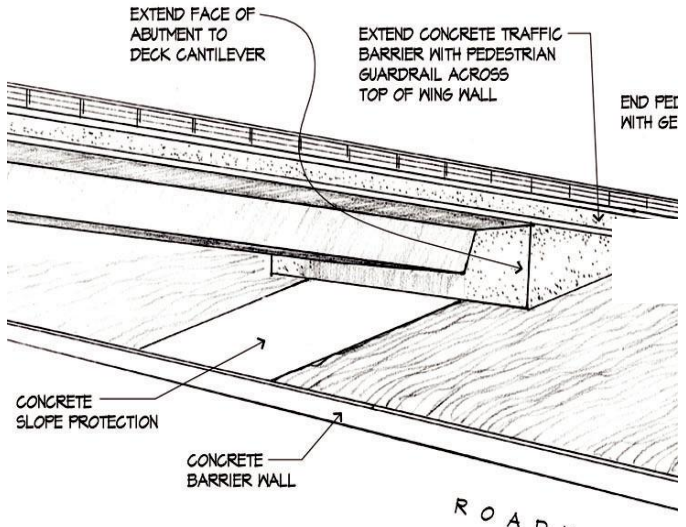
Concrete Barrier Extension onto Bridge Wing Walls.
